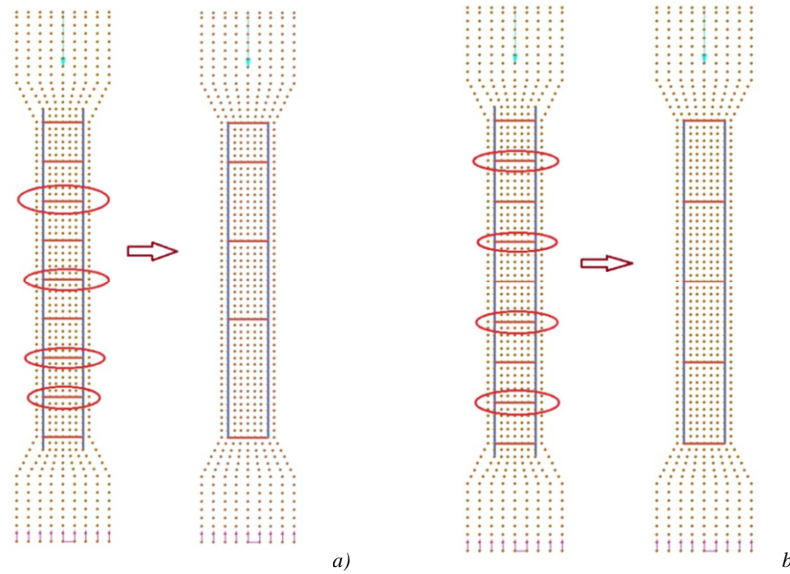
a) alternate stirrups failure; b) two consecutive stirrups failure
